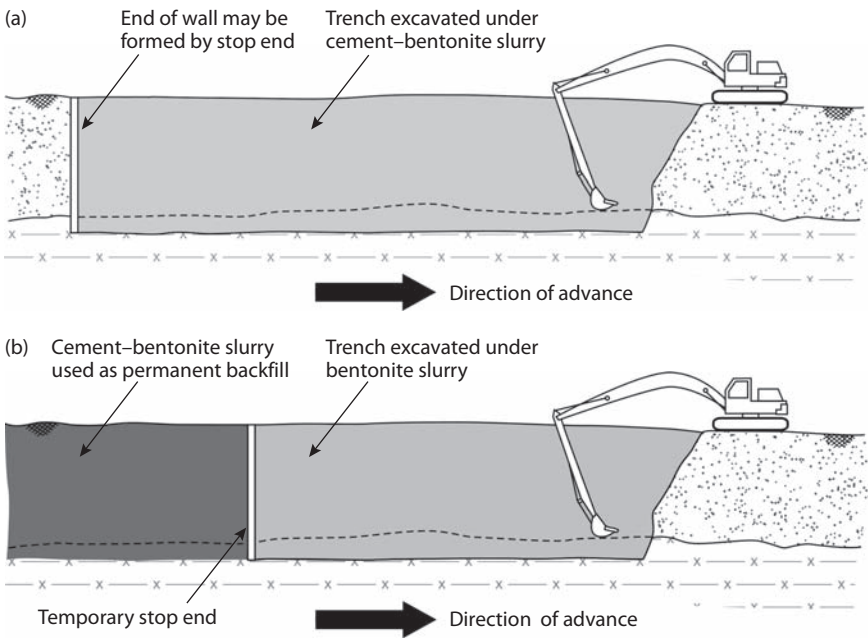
Construction sequence for cement–bentonite slurry trench wall. (a) One-stage construction for cement–bentonite wall. (b) Two-stage construction for cement–bentonite wall.
